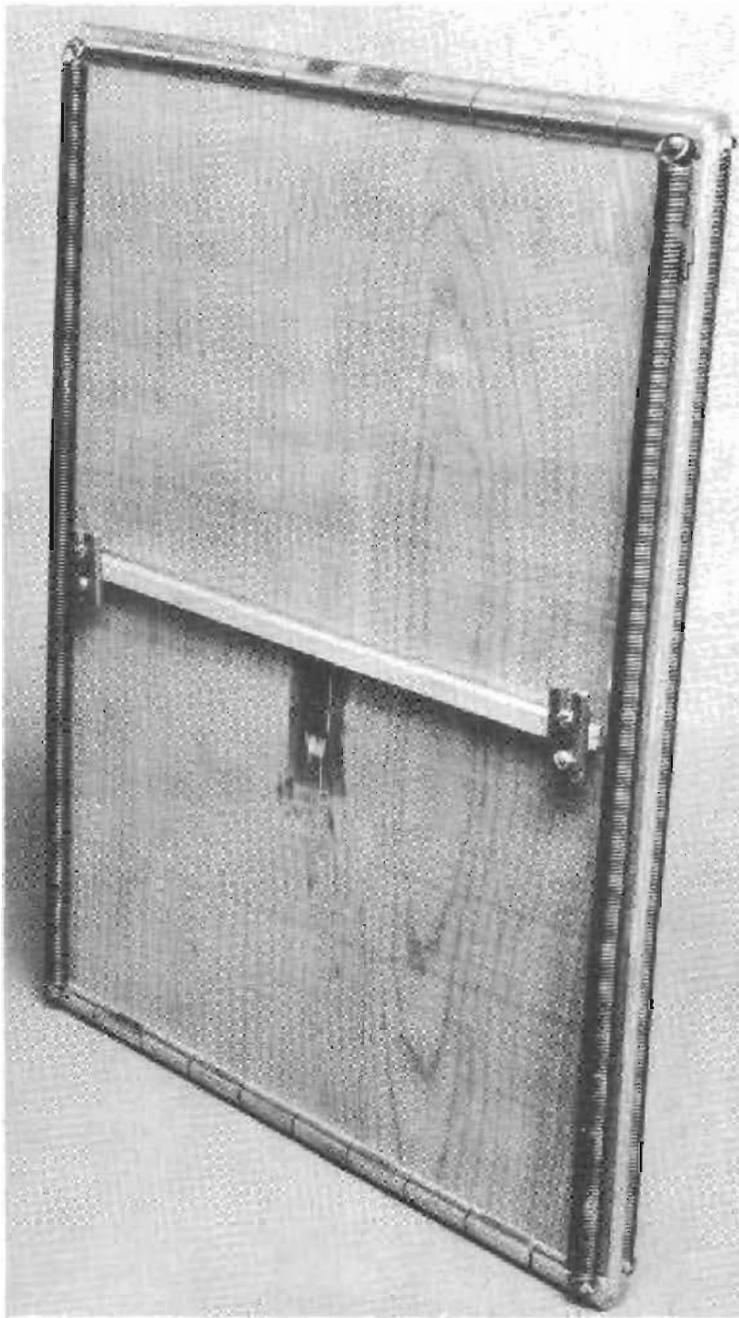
Stiffened flat plywood plate mounted in segmented cylindrical steel loading rods prior to test. The method of restraining the ends of the stiffener to prevent separation at the ends, the metaelectric strain gage for measuring deformations, and the attachment of coil springs at the edges to reduce frictional restraint during test are shown.
